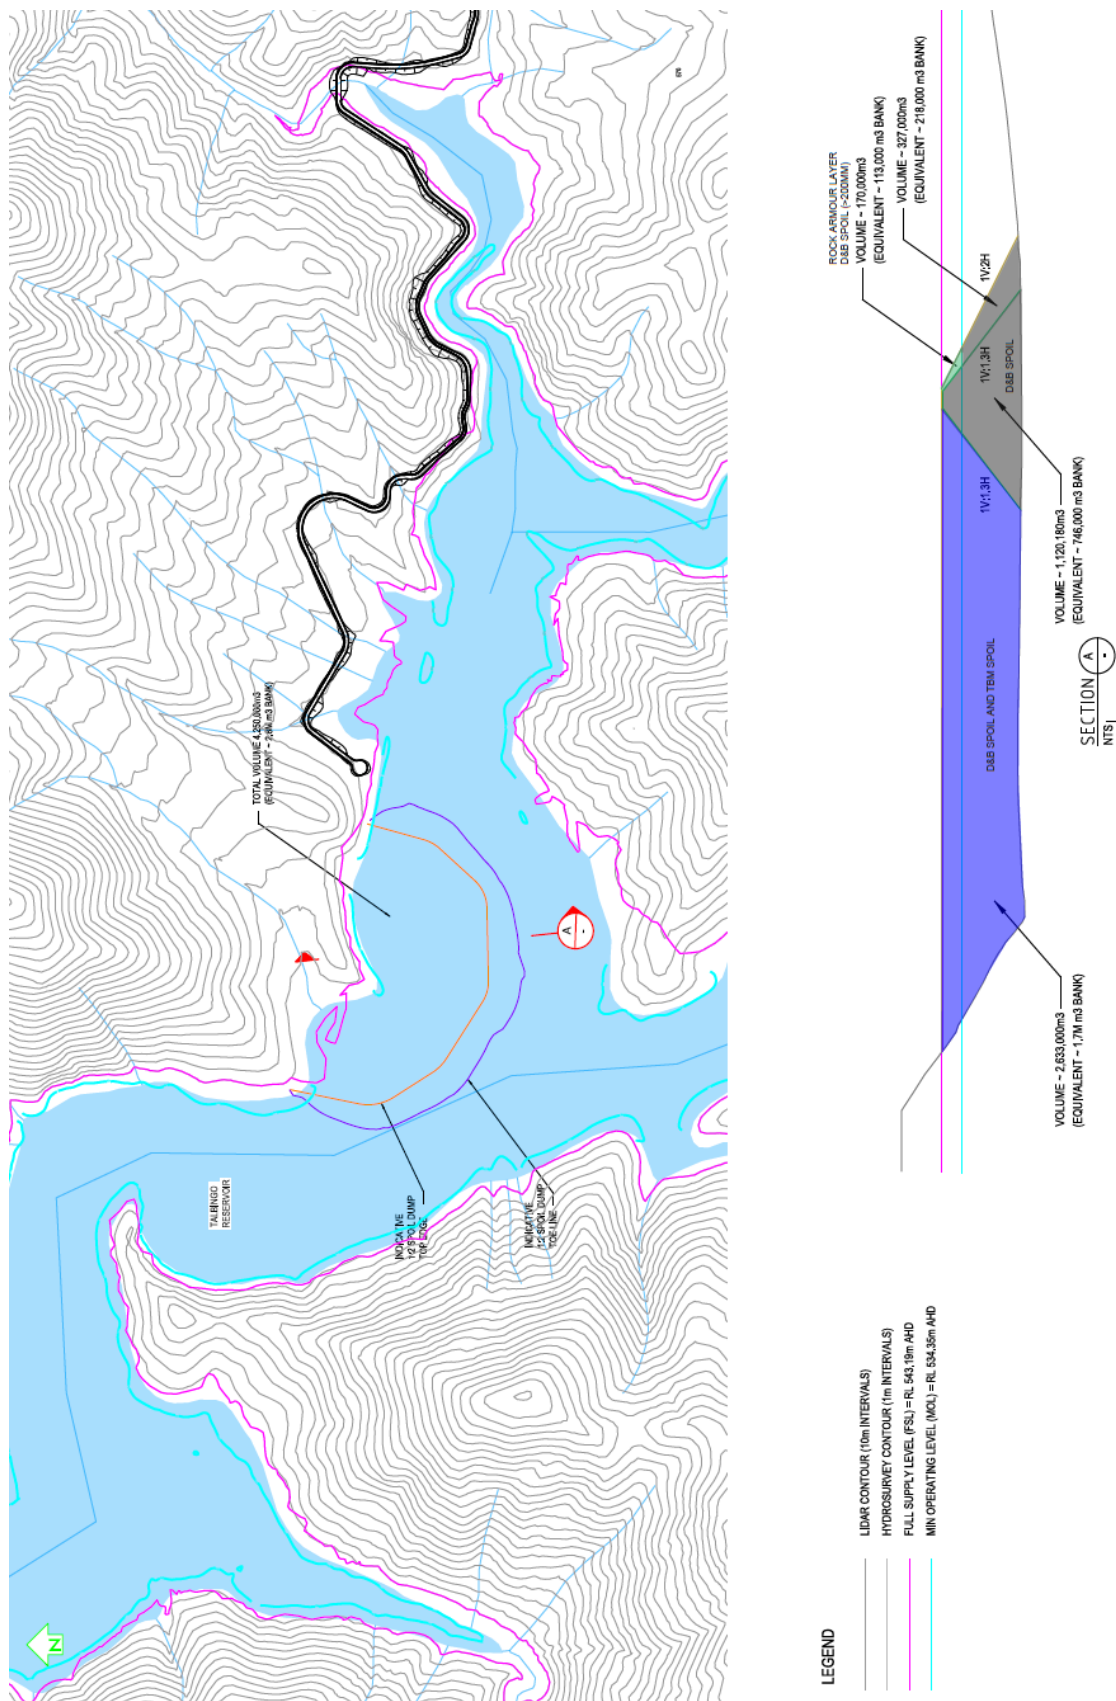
Talbingo-excavated rock footprint and section for Ravine Bay Placement method
